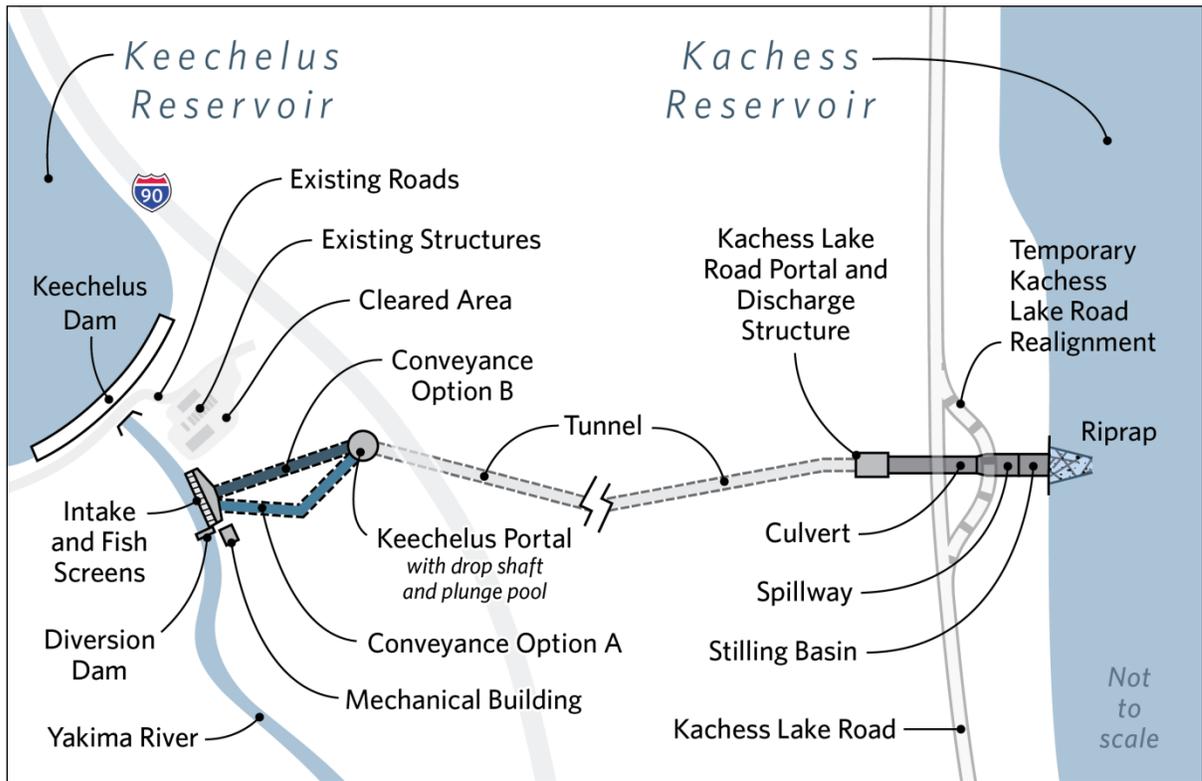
KKC North Tunnel Alignment Conceptual Site Plan
